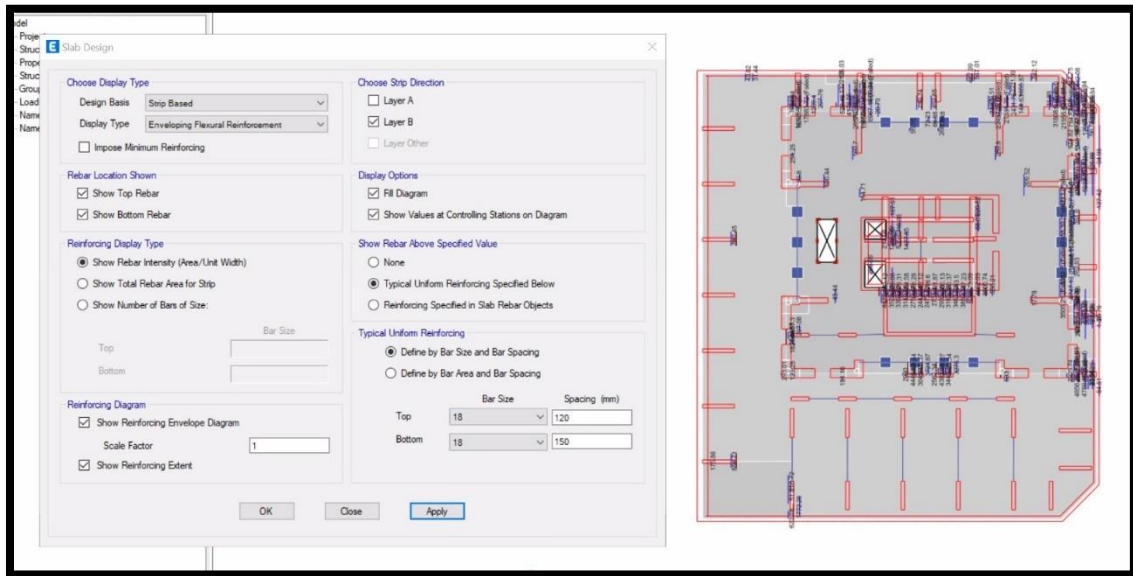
Demonstration for Odd Zones in Y-Direction in Ground Floor
